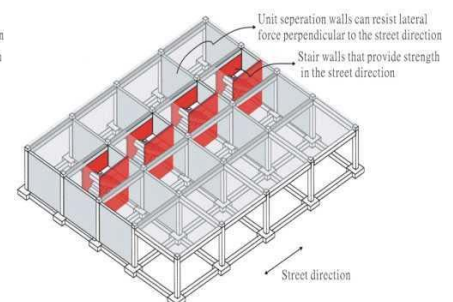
B: Seismic Strengthening (New Construction) - Wall Layout in the Street Direction
